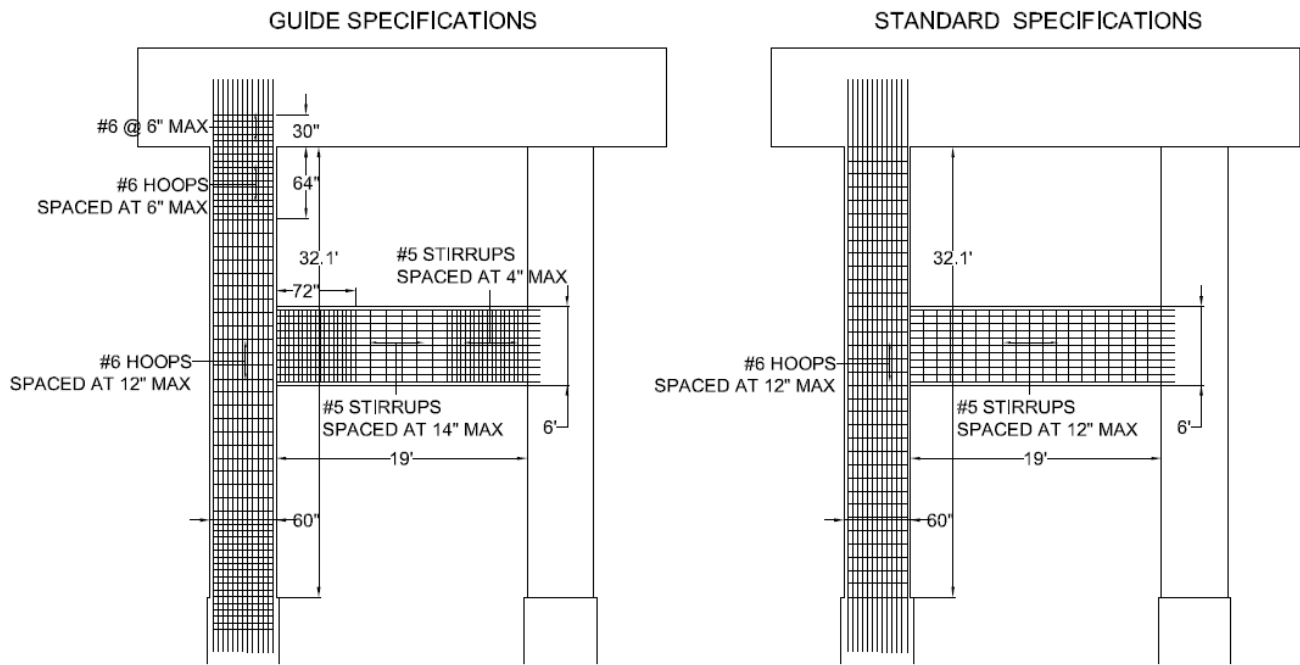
Scarham Creek Bridge Bent 4 Final Design Details
